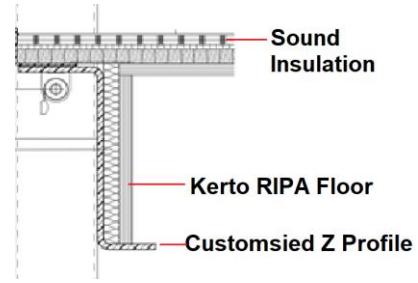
Customised Z Profile supporting Kerto RIPA floor elements.
